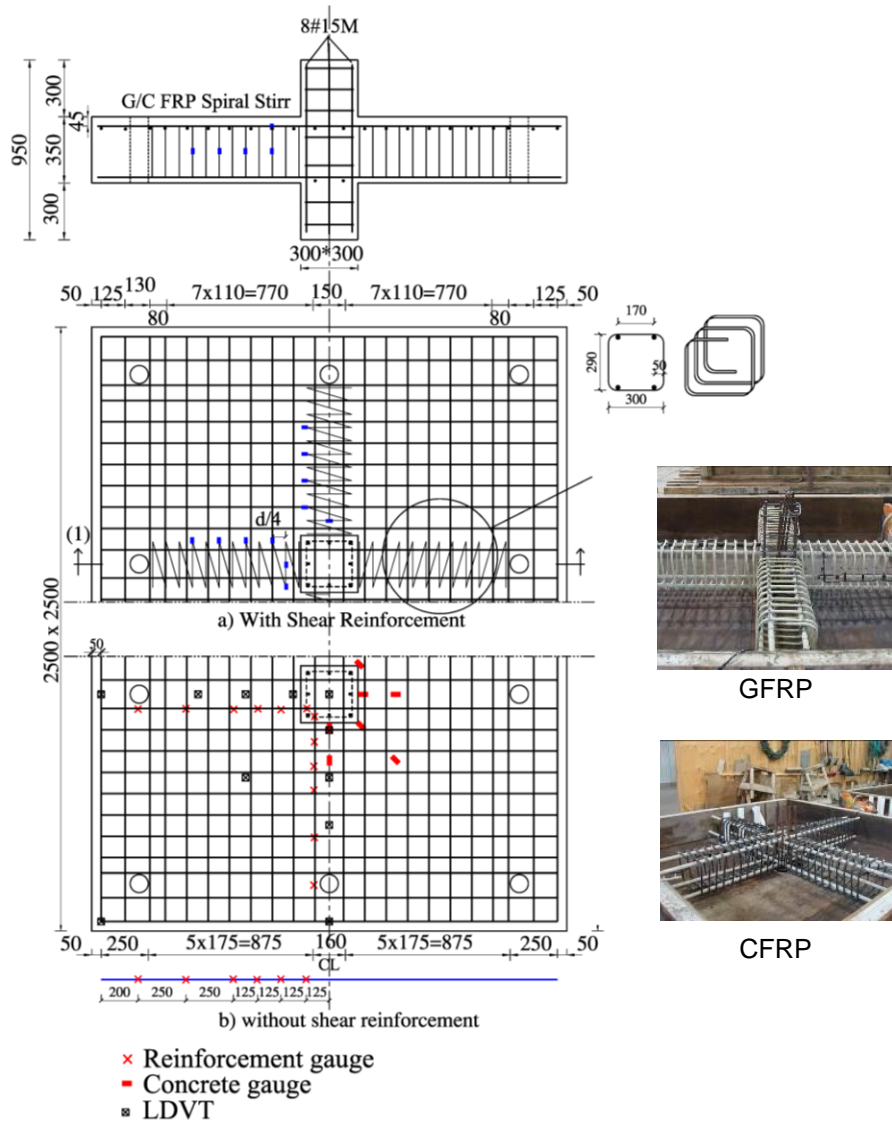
Details of test specimens: geometry, reinforcement configuration, and instrumentations
